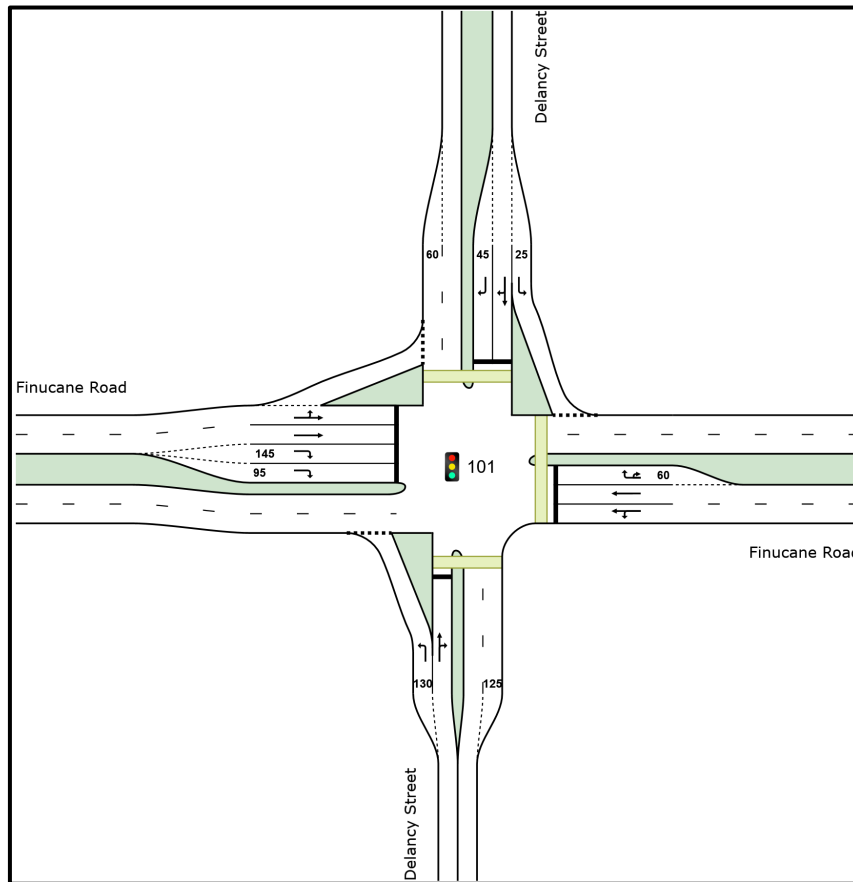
Proposed Finucane Road / Delancey Street Signalised Intersection Layout
